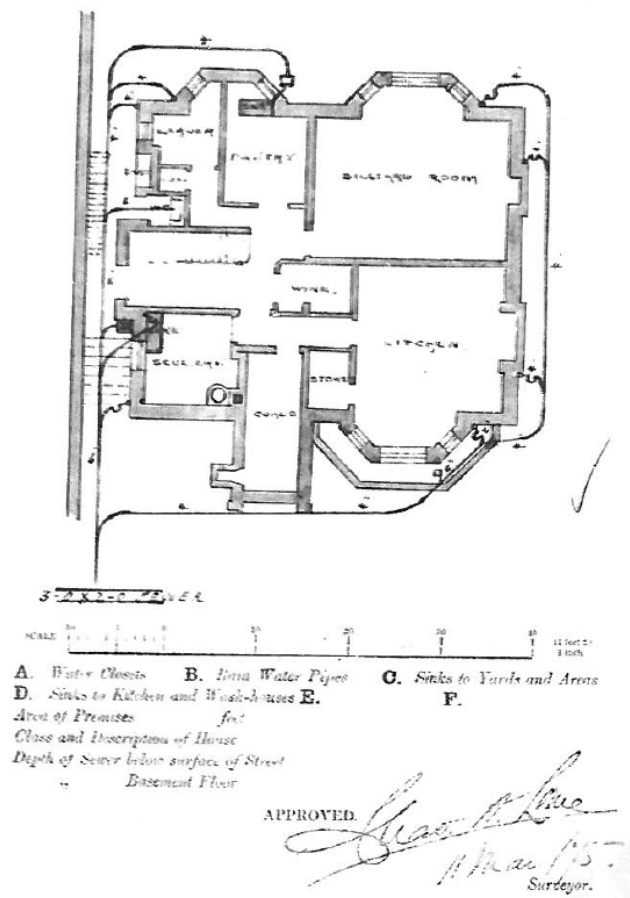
Basement Floor Drainage Plan, no.9 Arkwright Road, Hampstead, London, 1874 (London Borough of Camden Local Studies and Archives Centre)
